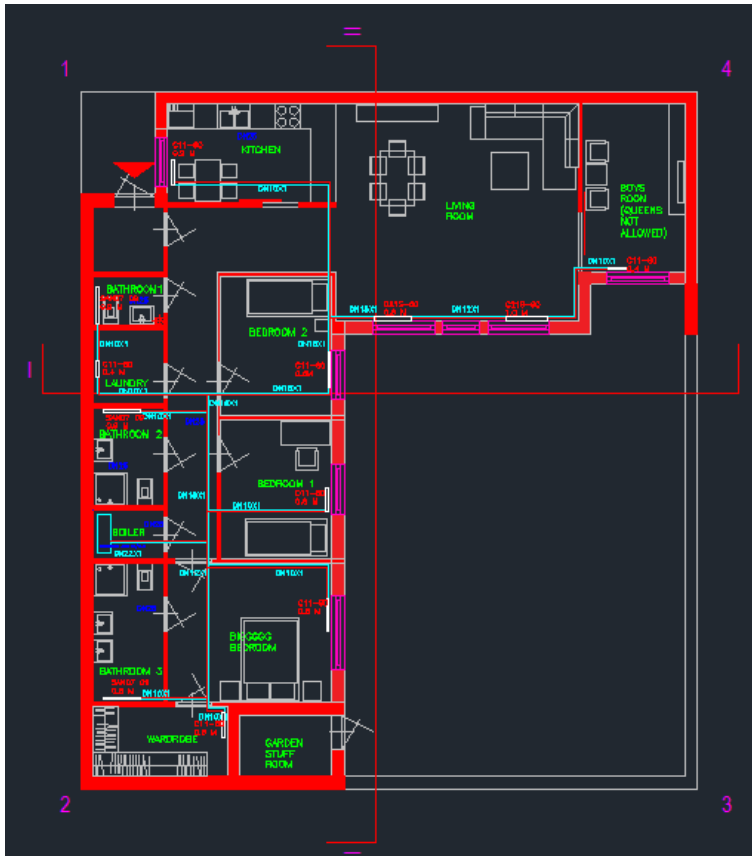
The plan of the residential building with the heating system (Source: a teamwork of VIPSKILLS students)
